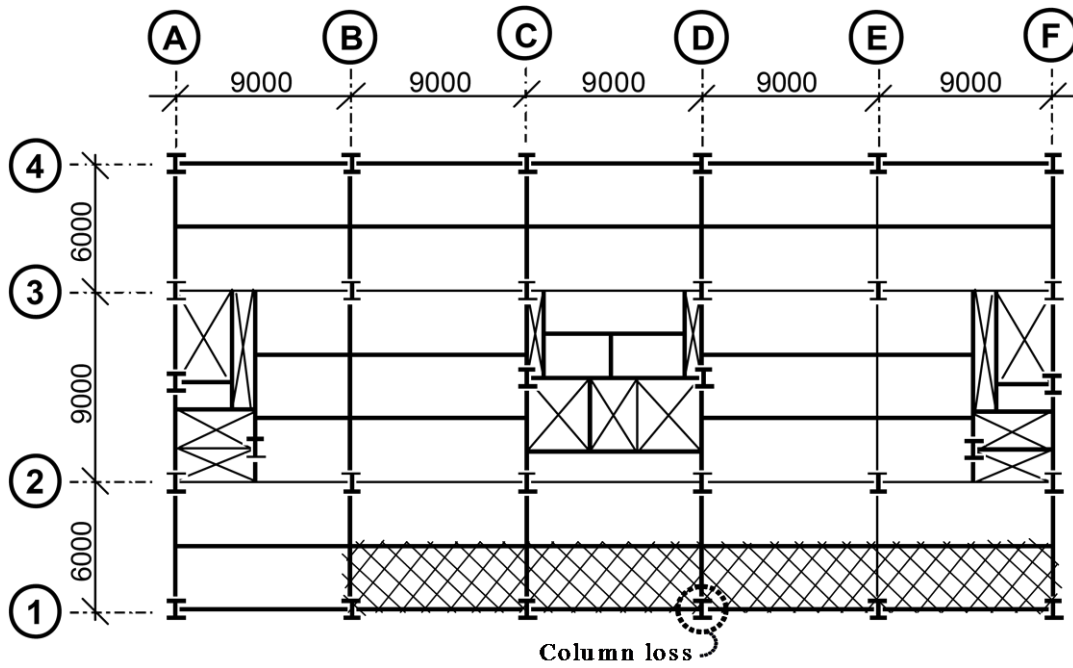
Floor layout of Cardington building and 2D frame studied (hatched region)
